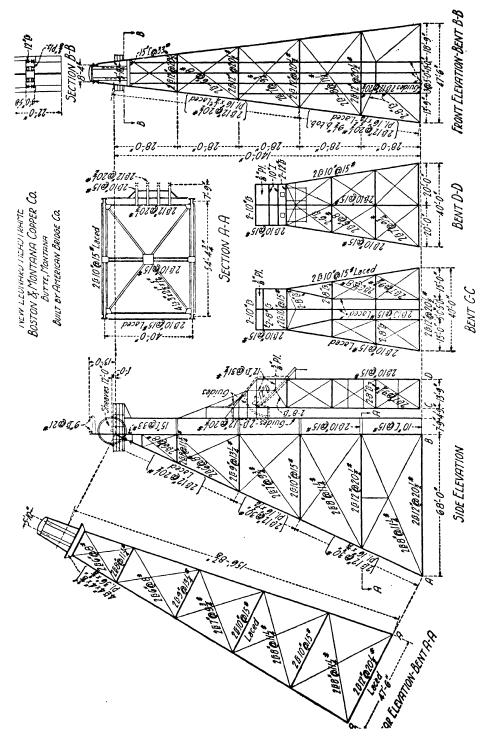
NEW LEONARD STEEL HEAD FRAME.
